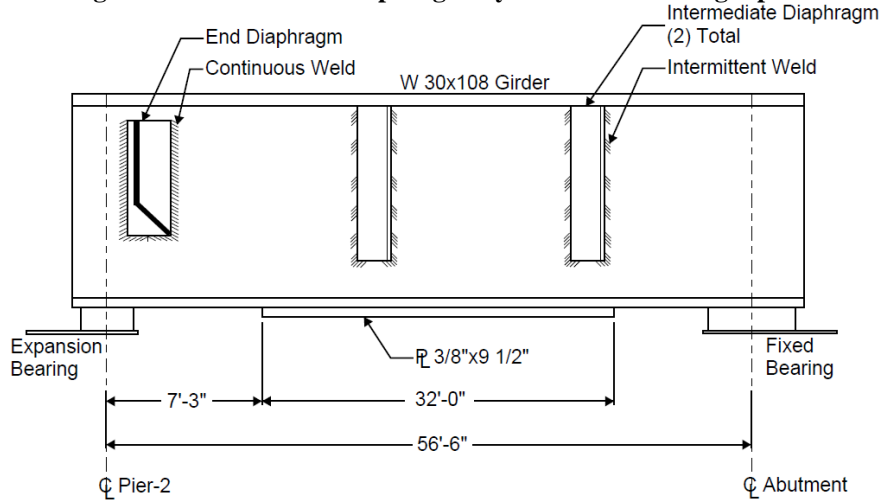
Typical girder elevation showing the partial depth diaphragms
